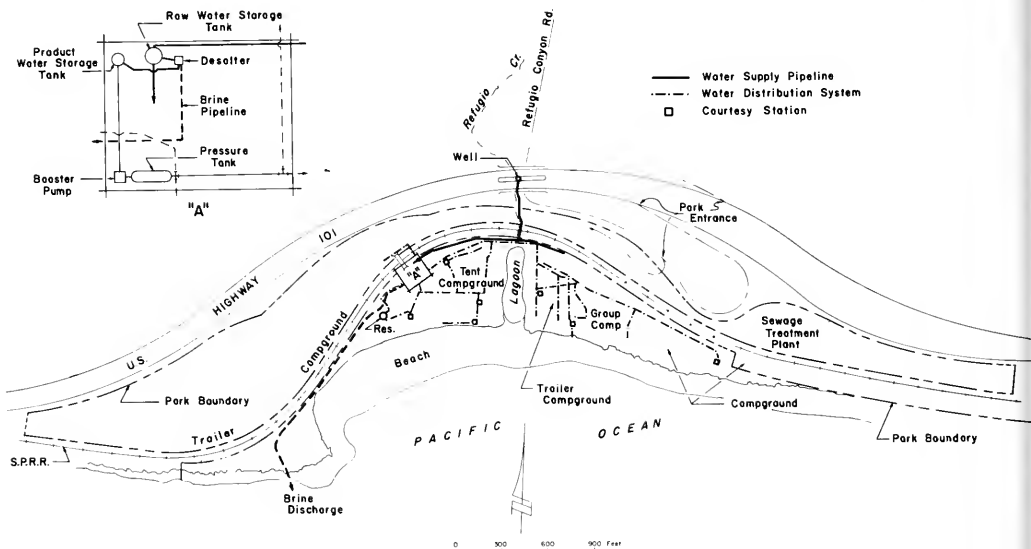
Location of Proposed Desalting Facilities at Refugio State Beach
